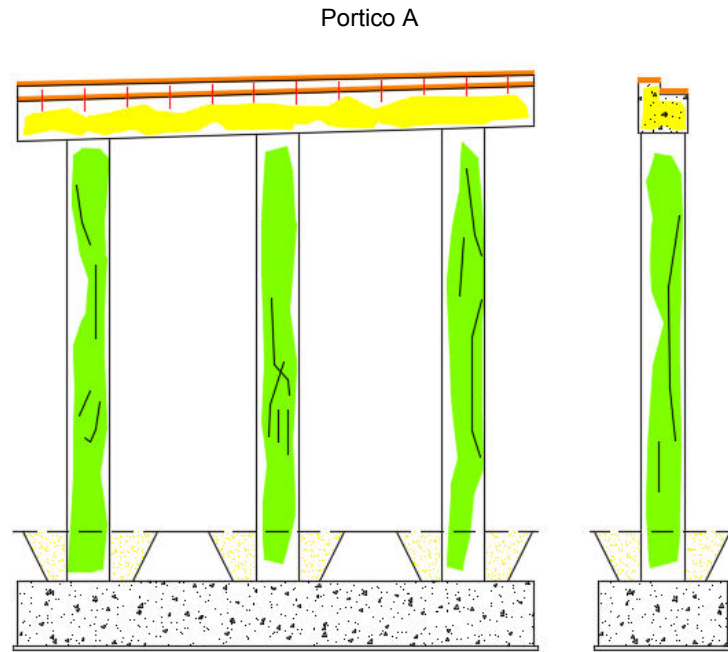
Vulnerable zones – main truss (Orange= Debris accumulation on abutment, Yellow= Moisture in the pier cap, concrete detachments and visible armor and Green = External cracks, concrete detachments and visible armor)
